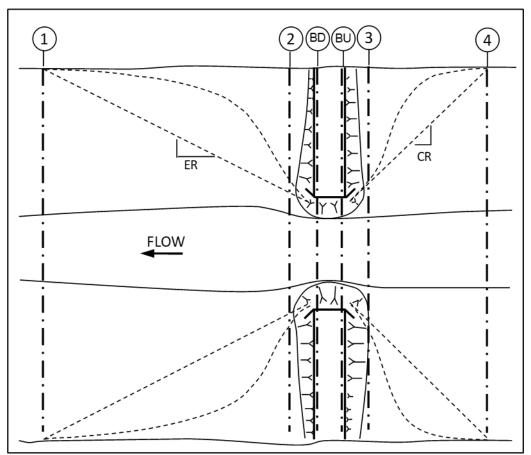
Plan-view layout showing cross-section identifiers referenced by the bridge hydraulics equations.
